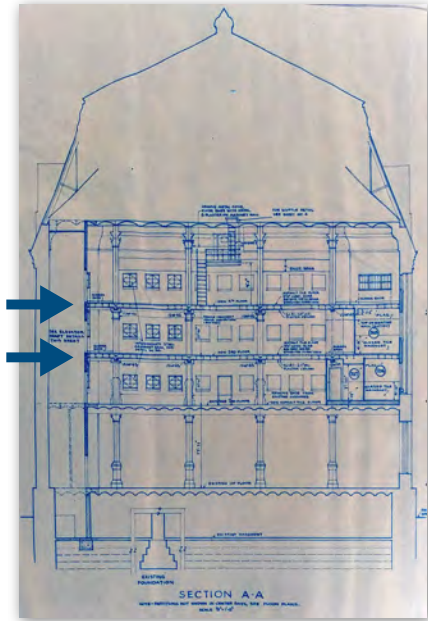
Section drawing showing the third and fourth floors to be inserted into the Rotunda, ca. 1959 (Facilities Archive, SCI Pittsburgh).
